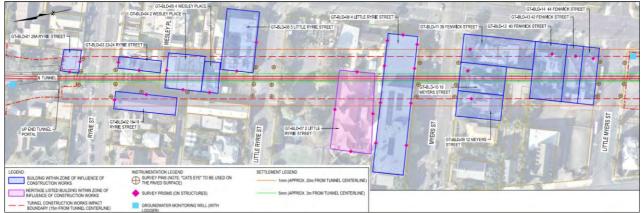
AERIAL PHOTO SHOWING THE LOCATION OF BUILDINGS INSTALLED WITH MONITORING DEVICES WITHIN THE ZONE OF INFLUENCE OF TUNNEL CONSTRUCTION WORKS. (SOURCE: AURECON/VLINE)
